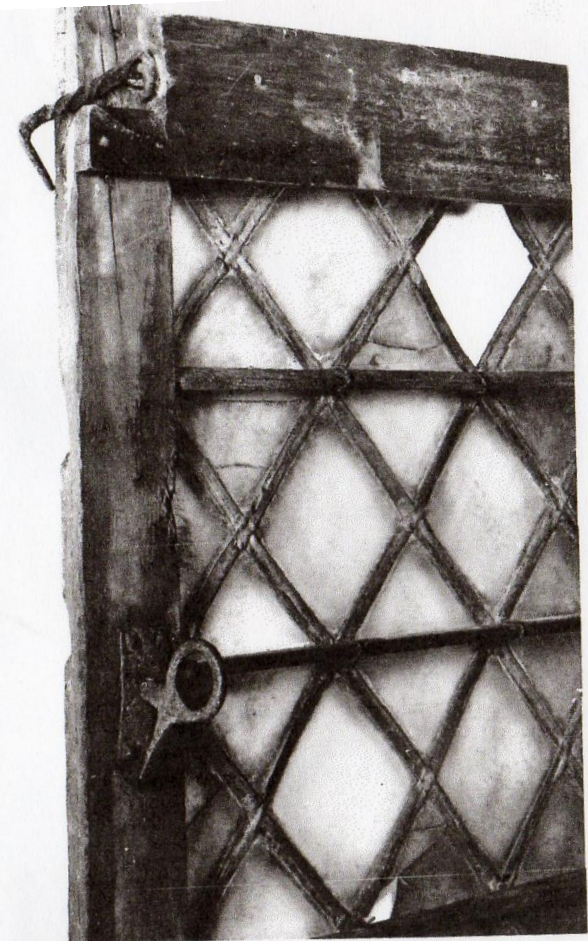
B. Buffum house, Salem, Mass., probably seventeenth century. Demolished. Casement window sash, detail of interior surface (with later board reinforcement along upper rail). Photo, J. David Bohl, 1978.
